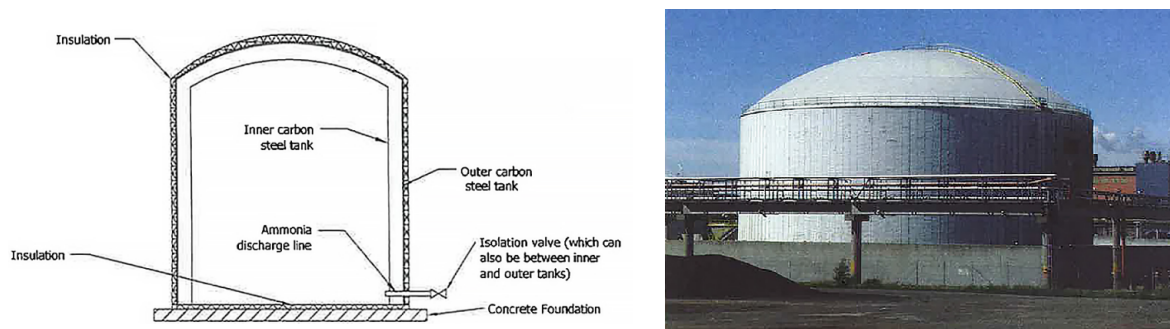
Tank with separate roofs and steel outside and interior walls.
